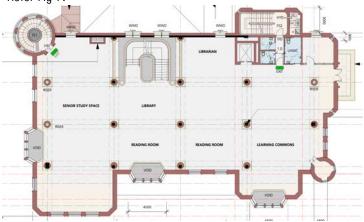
Typical proposed floor plate. Existing floor plate in grey
